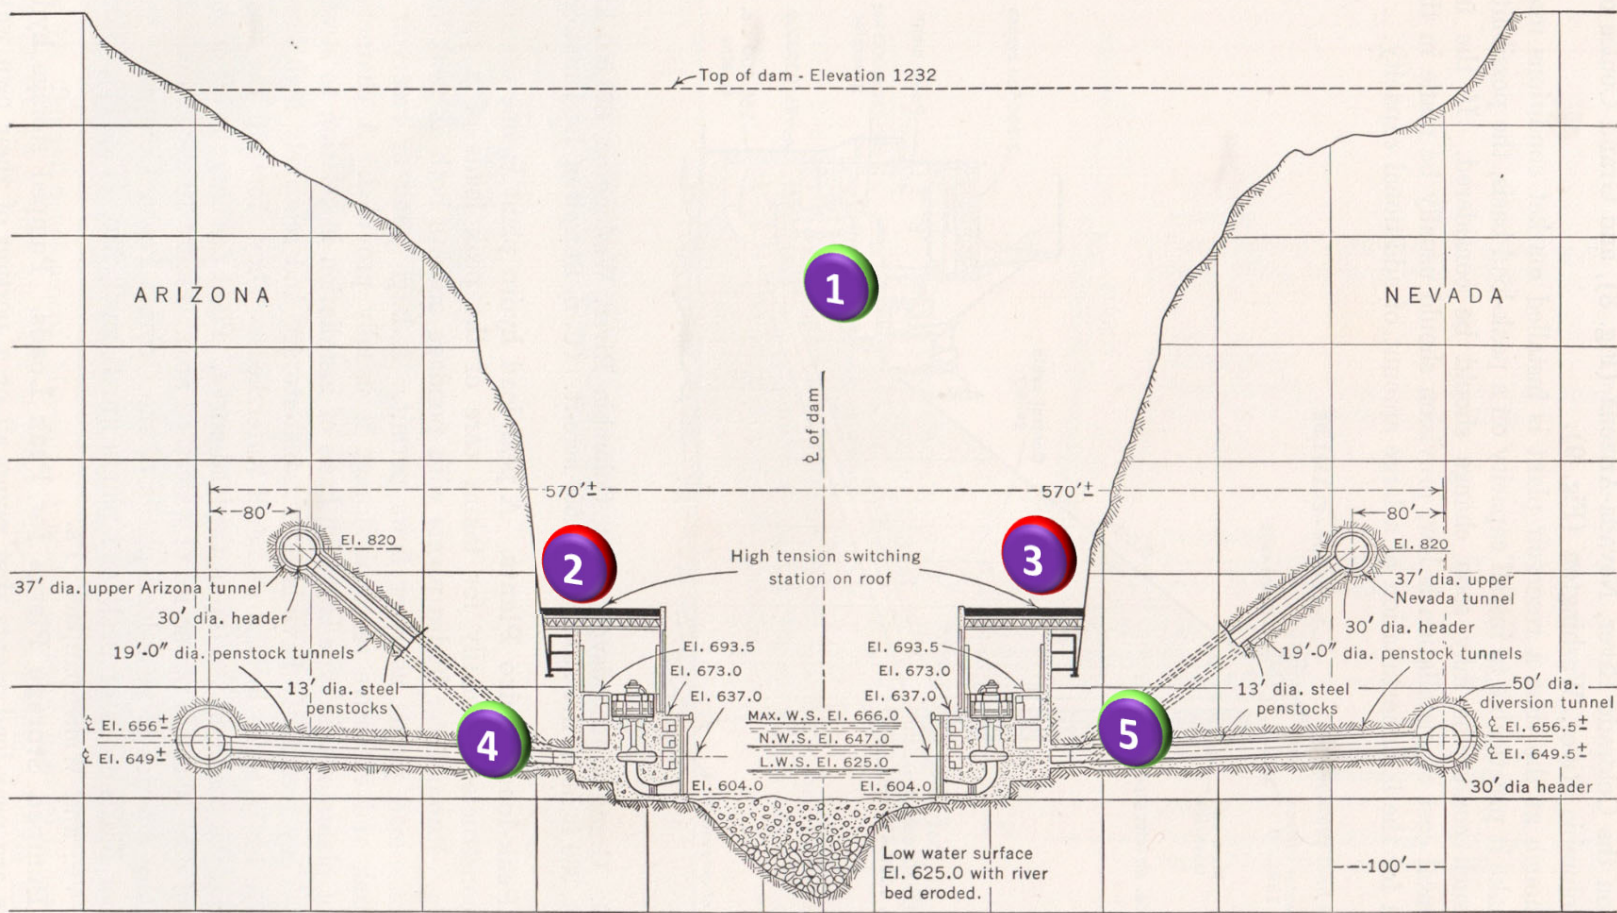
Hoover Dam development cross section through powerhouses in gorge just below dam.
